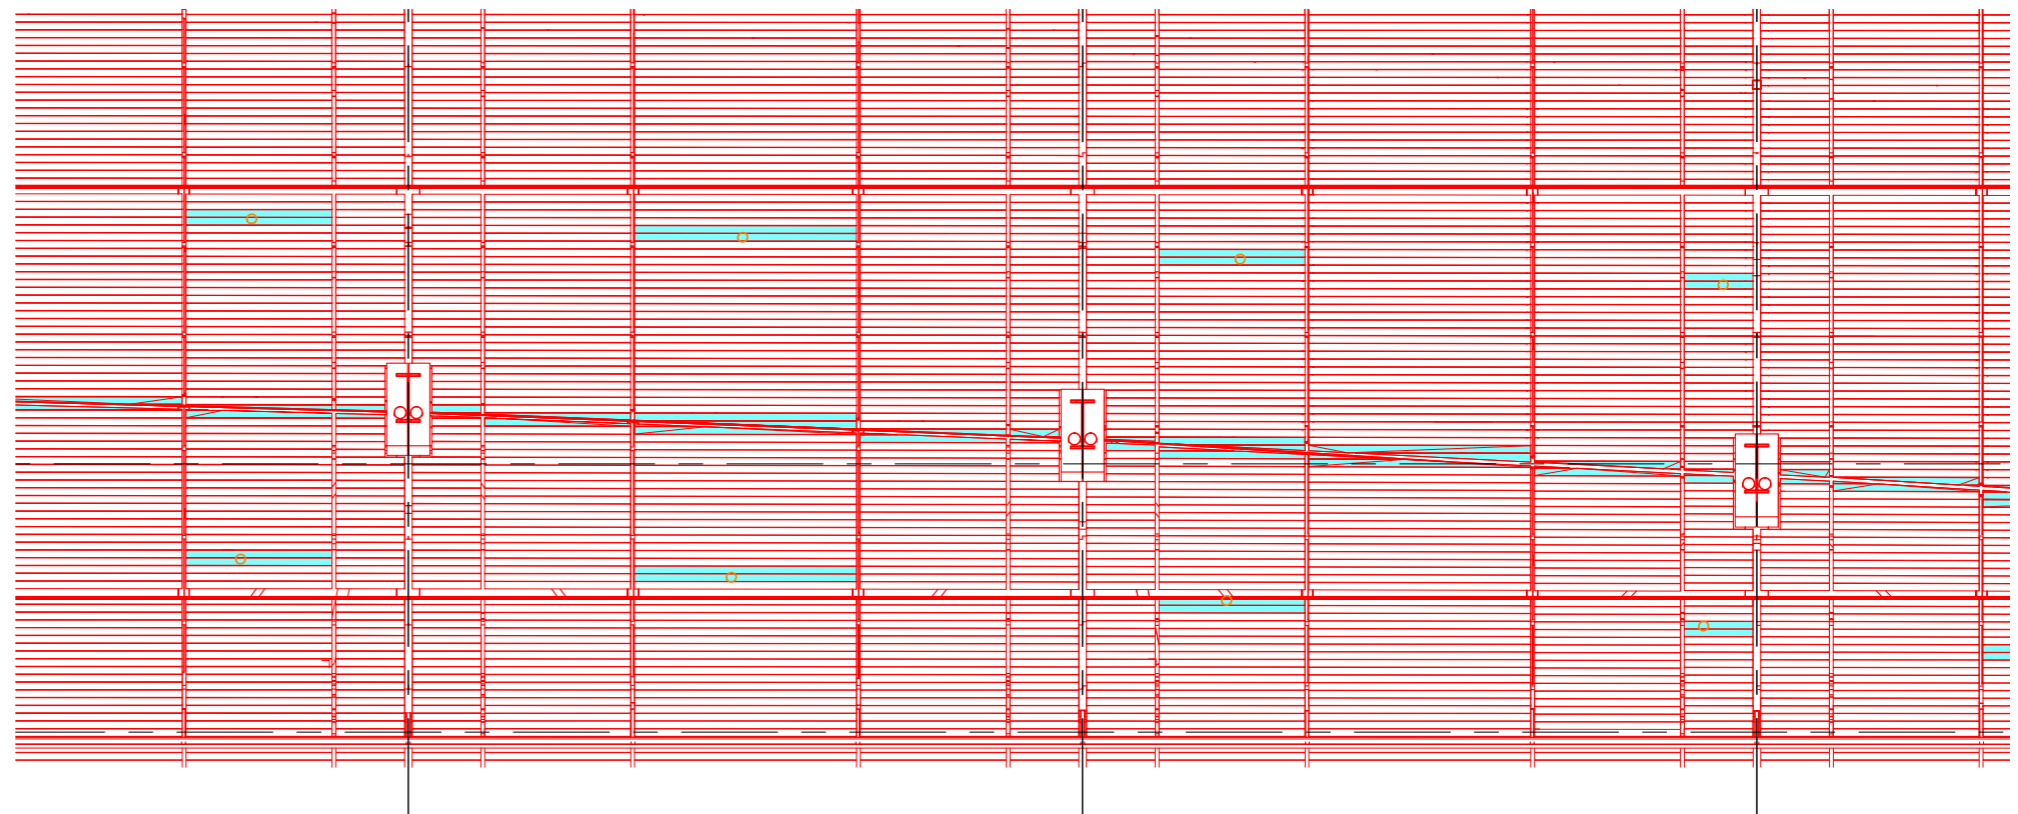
Soffit close up plan for roof C, showing the custom cut panels to suit, the curve, speakers and vertical cladding locations
